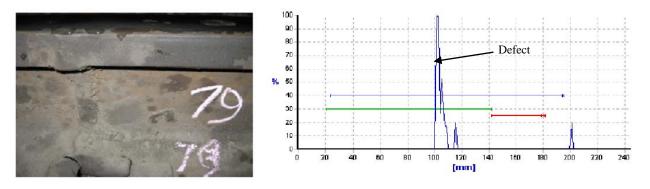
Crack in flash-butt welding in 101 mm depth
